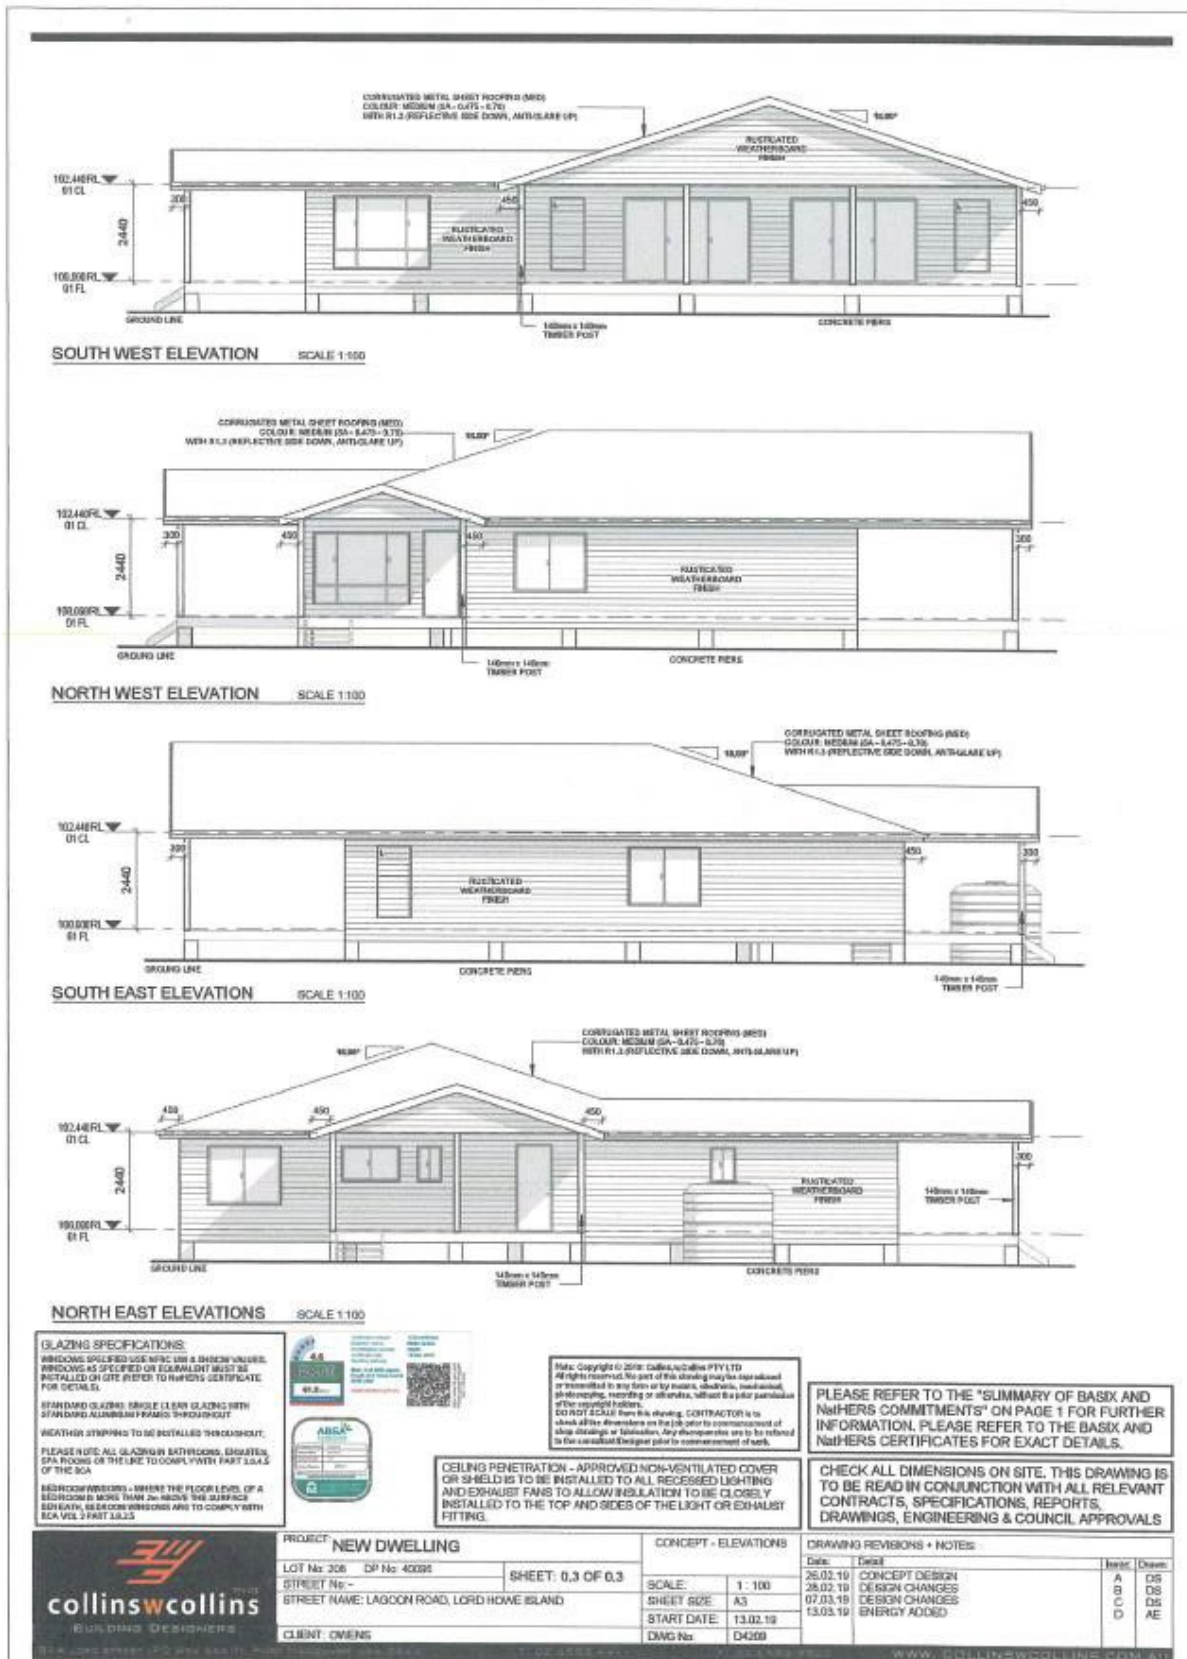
Applicant's proposed Lot A Dwelling Elevations
